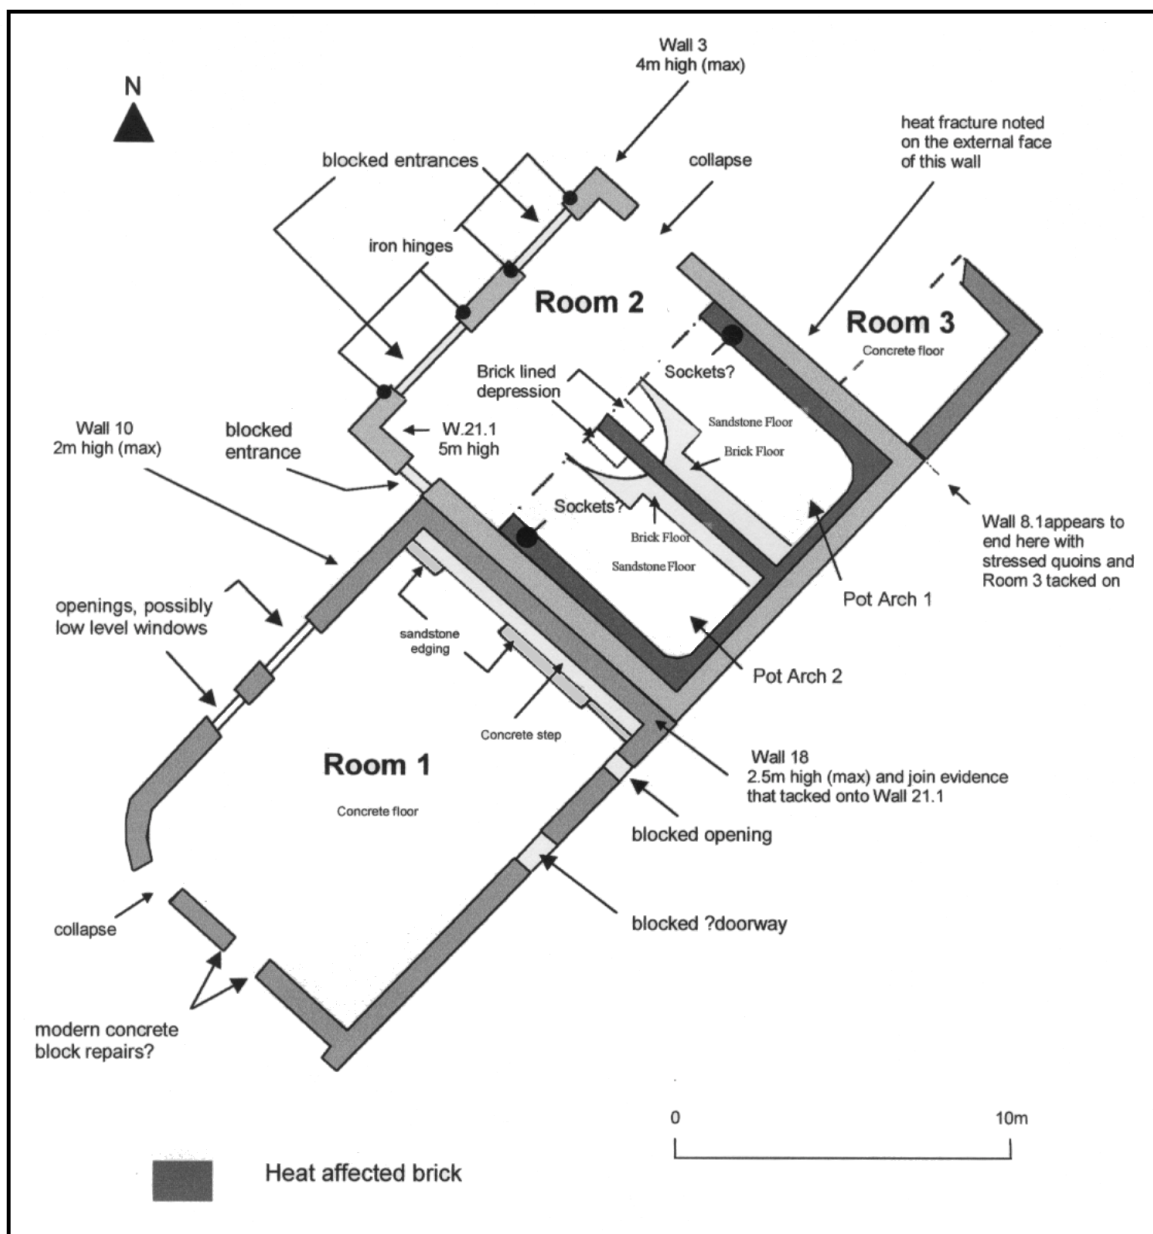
Schematic Plan of Rooms 1 - 3, detailing blocked openings (from Figure 3 in original report)
